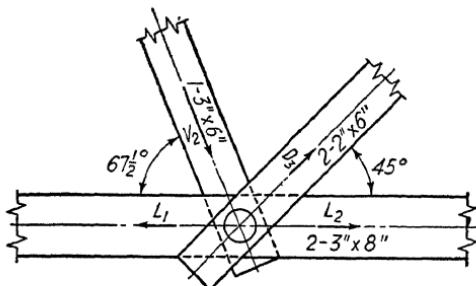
Lower chord joint for 50-ft. Fink truss.
